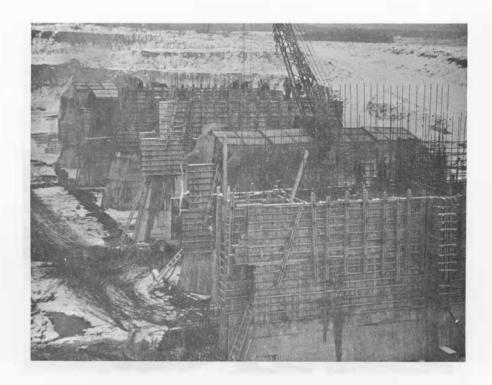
Ground view of the concrete piers seen in Figure 5. The tops of three of the piers are covered to allow steam heating of the curing concrete during the cold weather.
